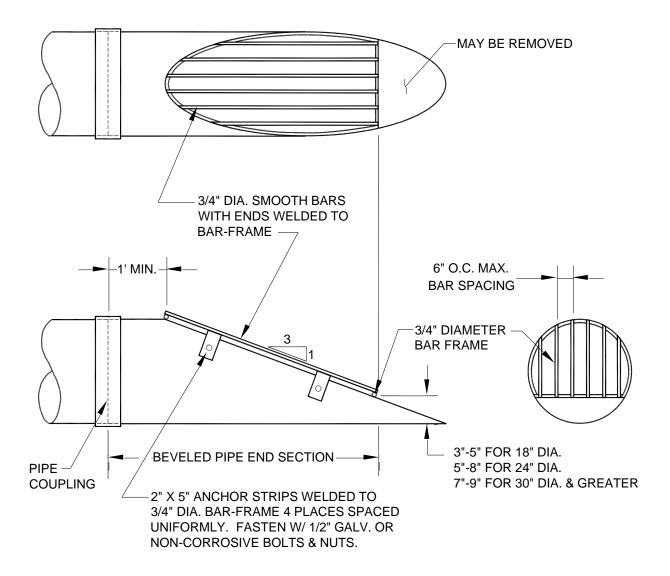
E DEBRIS BARRIER (IN ROAD RIGHT-OF-WAY)
